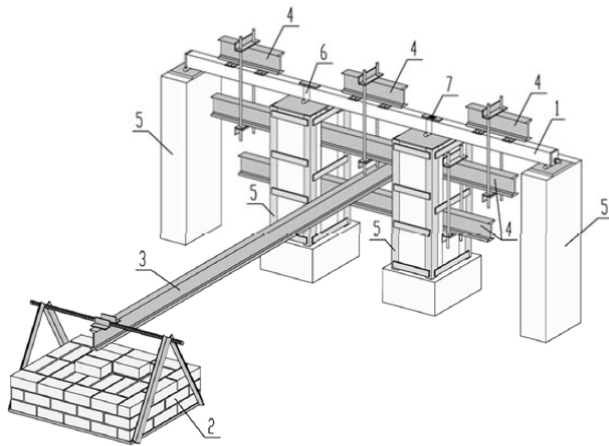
Three-span beam of solid or composite section, without or with prestressing in a case of sudden disconnection of the torque coupling in the section above the support: 1 – experimental beam design; 2 – loading platform with loads; 3 – lever; 4 – switchgear; 5 – supports; 6 – over-bearing connecting part; 7 – calibrated connecting part.
